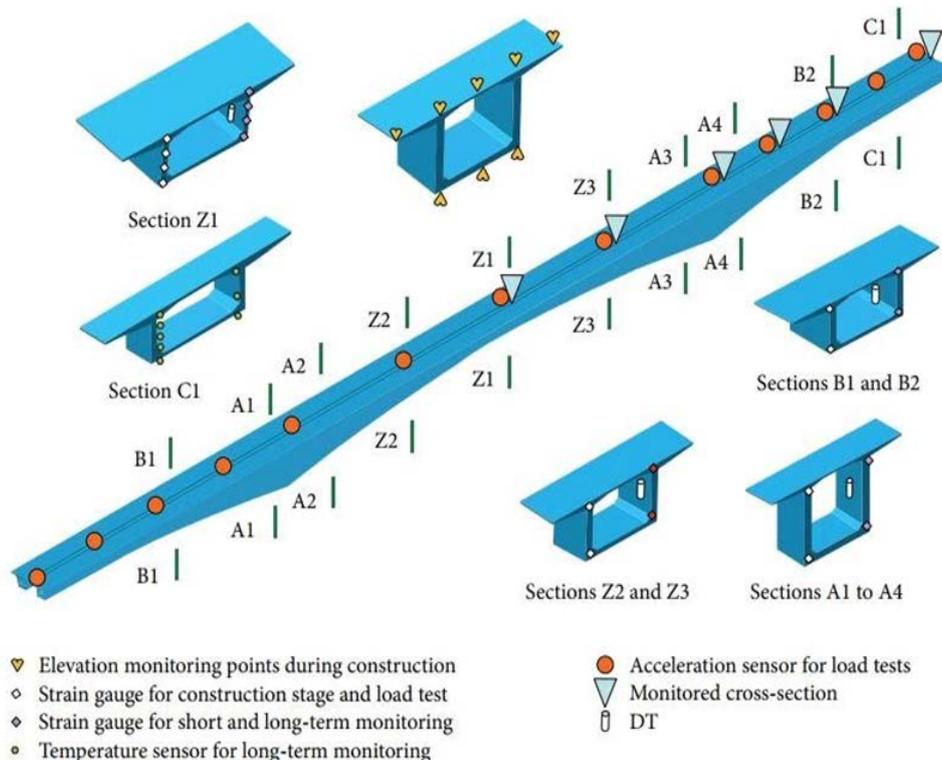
Sensor layout of Jinghang Canal Bridge [21]
